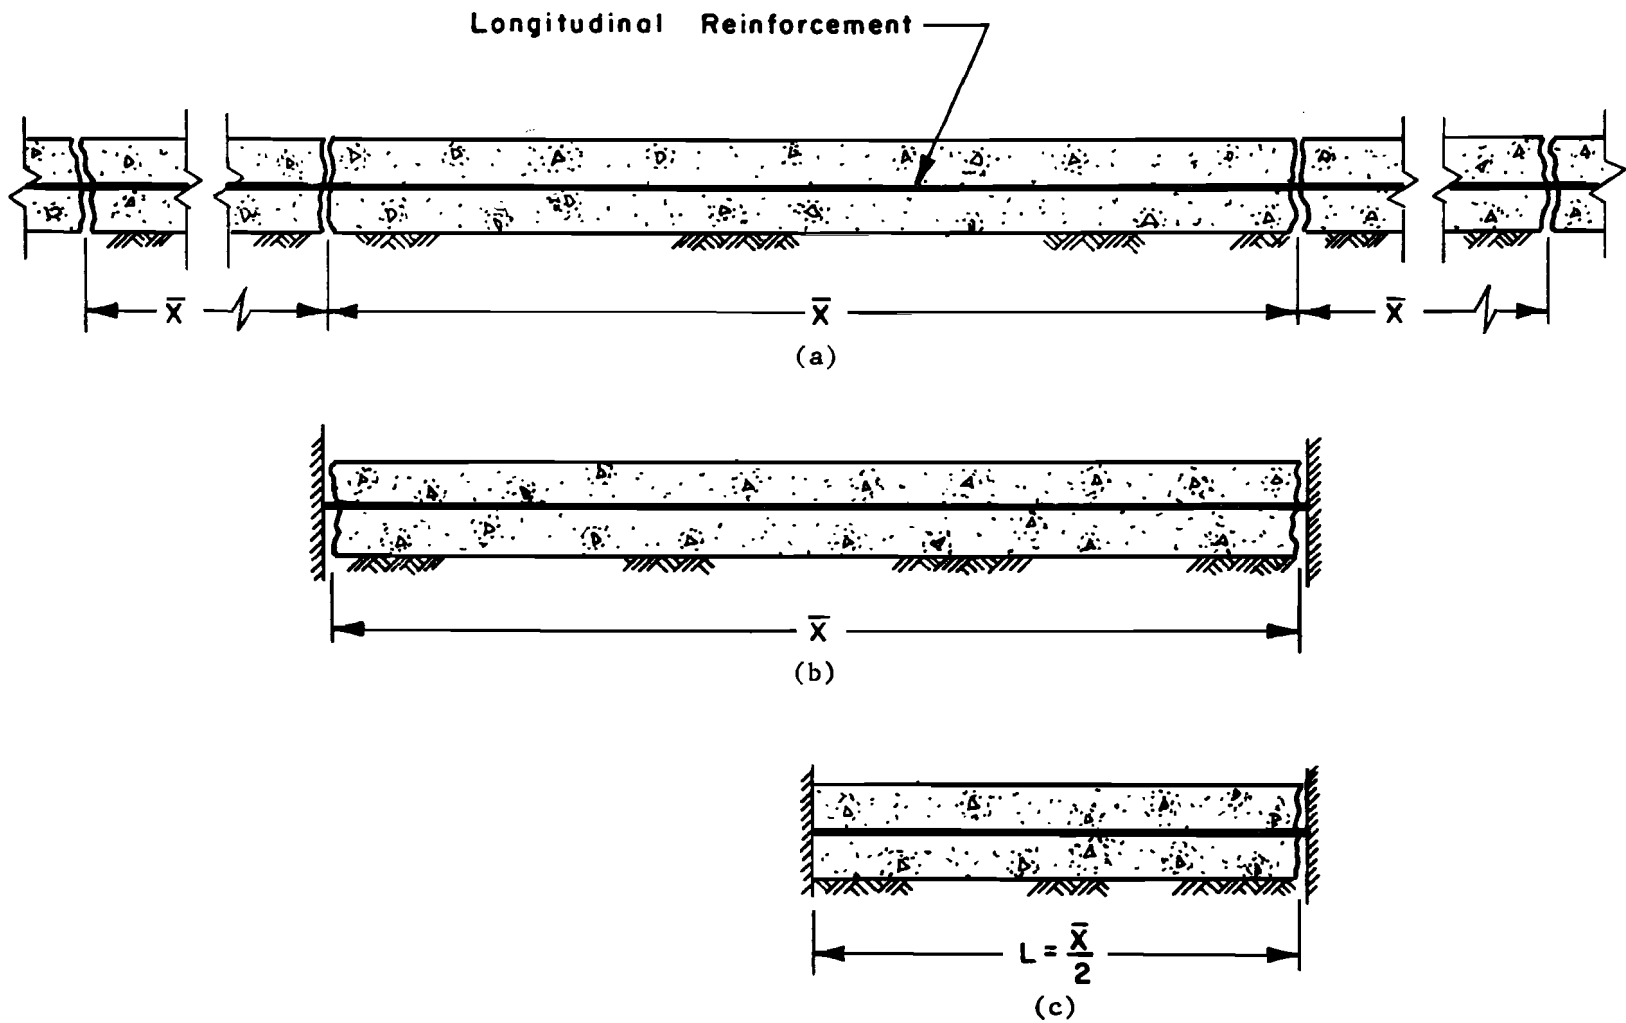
Typical slab segment in continuously reinforced concrete pavement.
